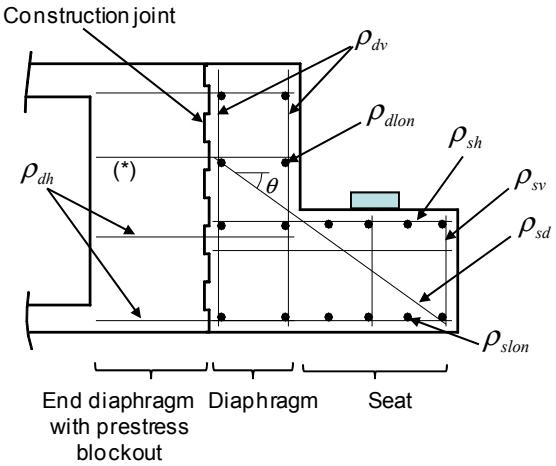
Cross section and reinforcement steel designations of ISH of prestressed box-girder bridges.
